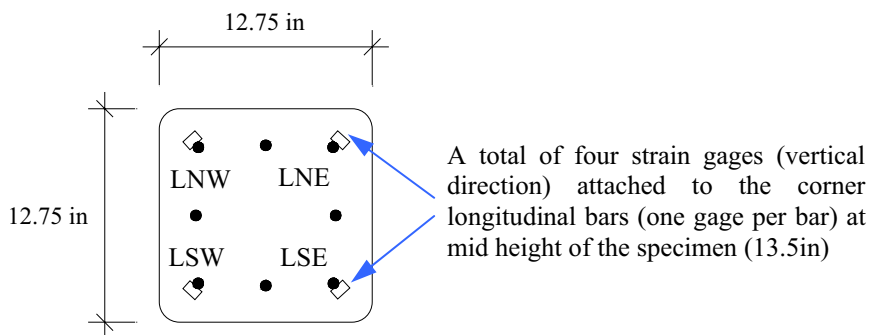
Section B-B; Strain Gages Location on Longitudinal Steel; Specimens E1, E2 & E3
